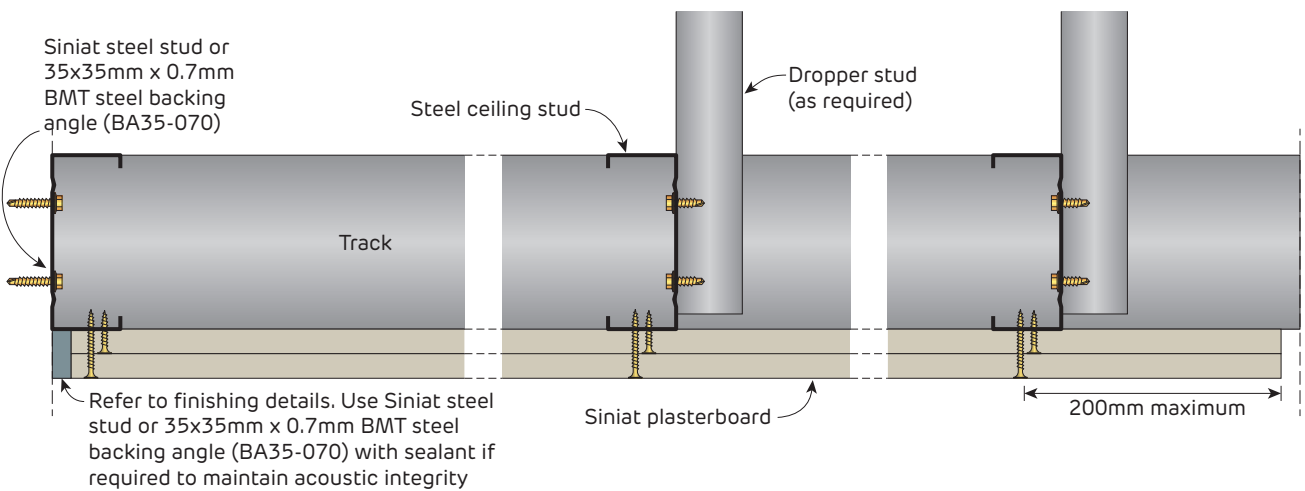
Stud Ceiling Type A2 - Fixed / Sliding
